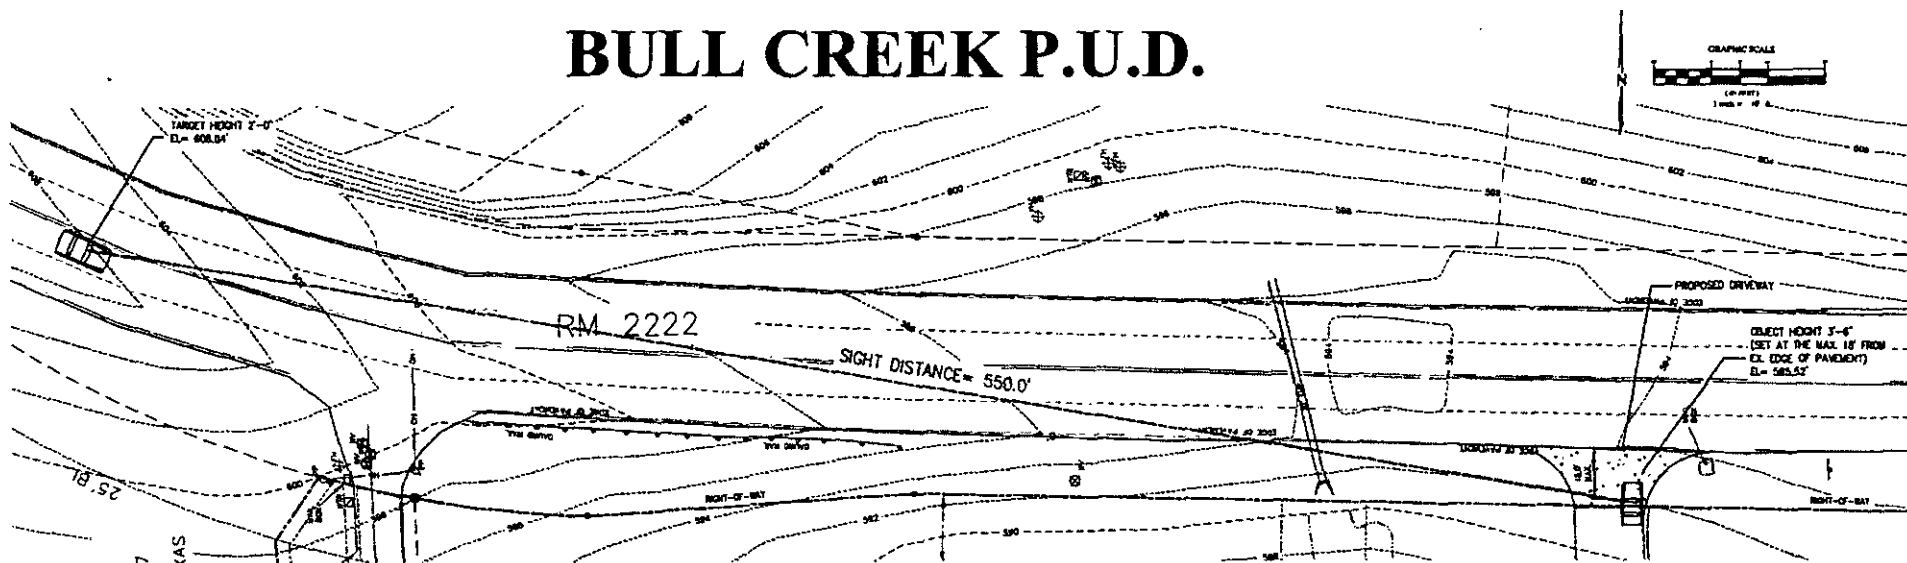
## EXHIBIT M - DRIVEWAY DETAILS - (1 of 5)
